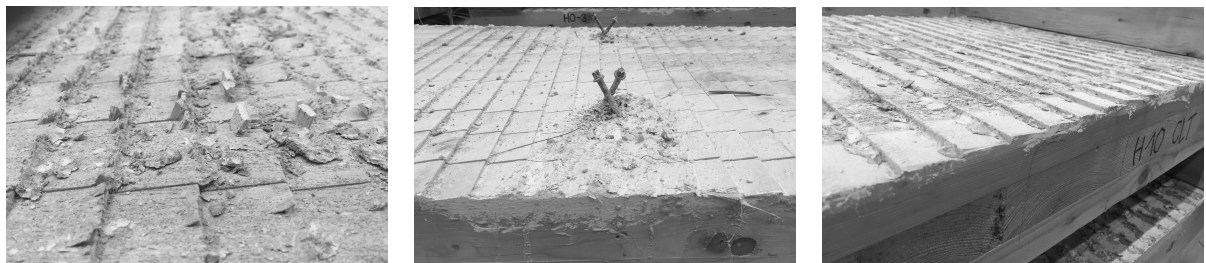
Failure modes and concrete cracking observed during 4-point bending tests
